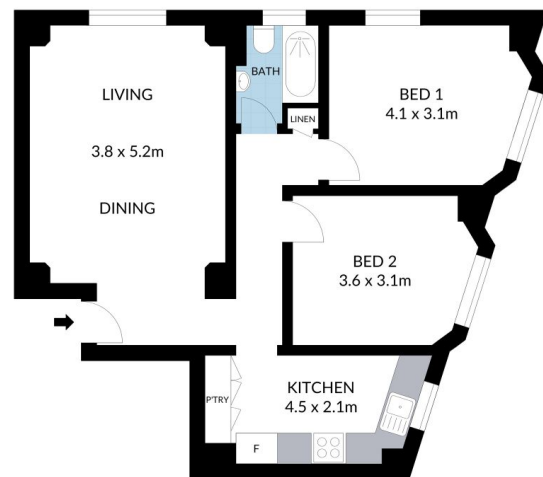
Example of 2 bedroom apartment in Kingsley Hall
